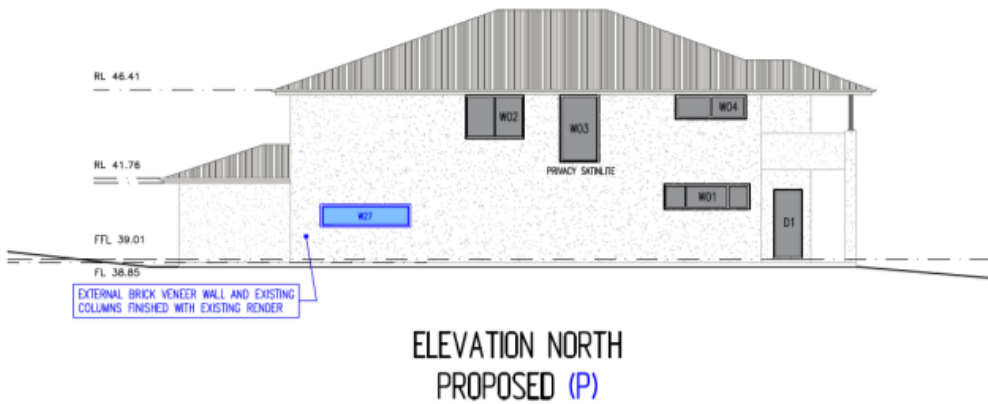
The proposed north elevation with proposed kitchen walling integrated with the existing dwelling and a new heat-resistant fixed window to enhance the natural light in the proposed kitchen. Note: the dwelling, viewed from the north, remains substantially the same development as originally approved under DA-866/2022.
